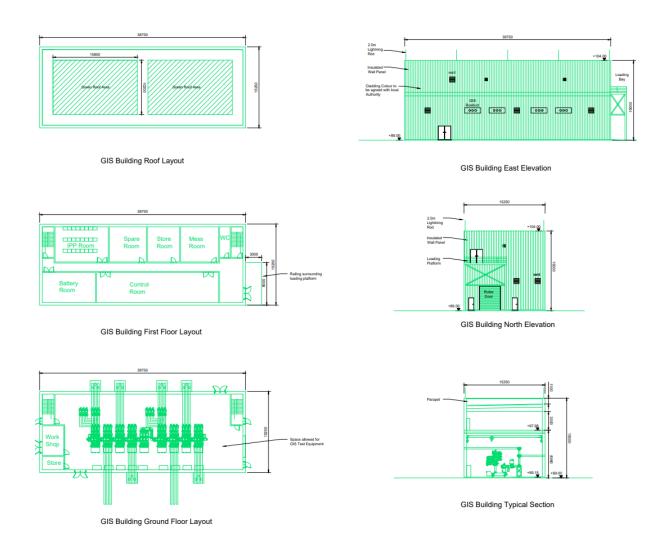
GIS Building Arrangement – extract from planning drawing no. 229100714-MMD-00-XX-DR-C-5020
